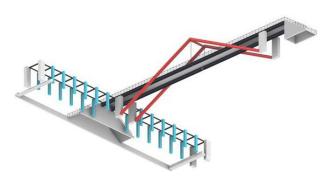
3D modelling reconstruction of the G. Polesello project for Accademia Bridge.
